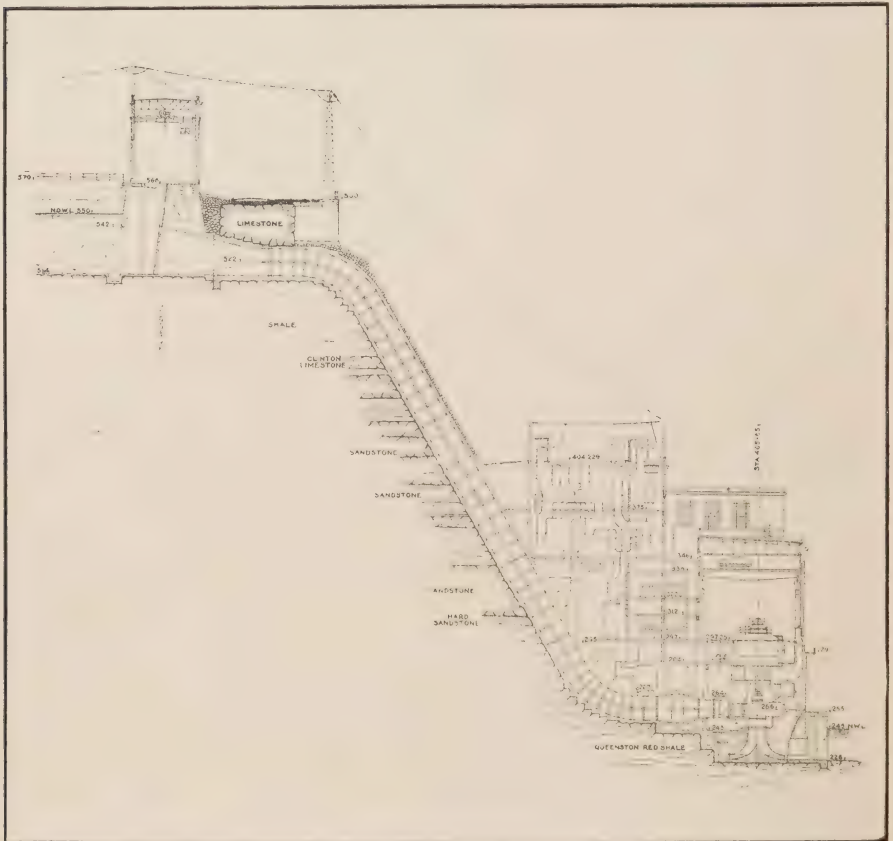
, Section through Screen House, Penstock and Generating Unit.
